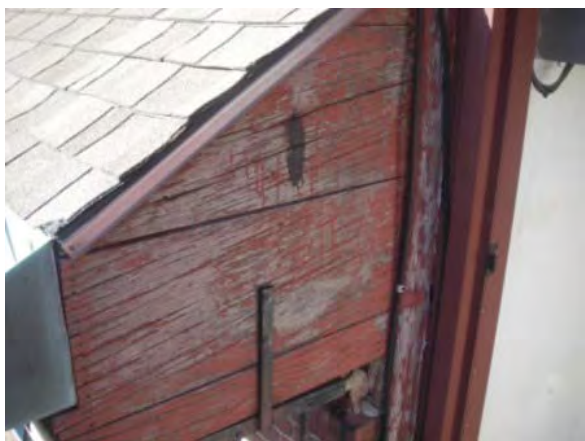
1902 BUILDING FIRE ESCAPE WALKOUT NEEDS WORK
